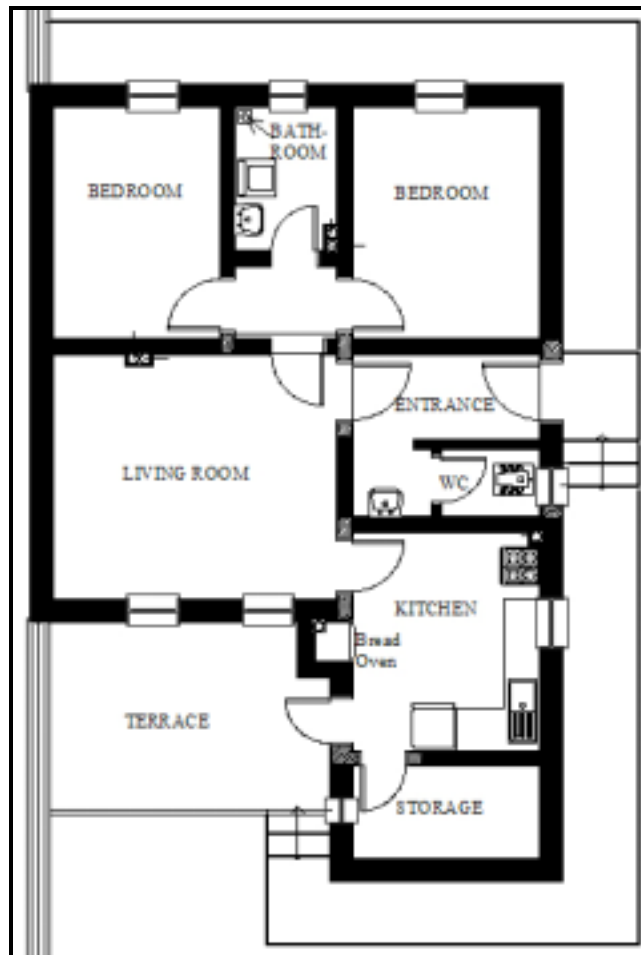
Original Plan of the PDH with *Typical Design* - Type 1 (84.81 m²)
